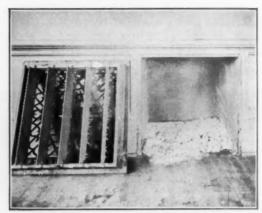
GRILLE REMOVED FROM OLD FOUL-AIR
